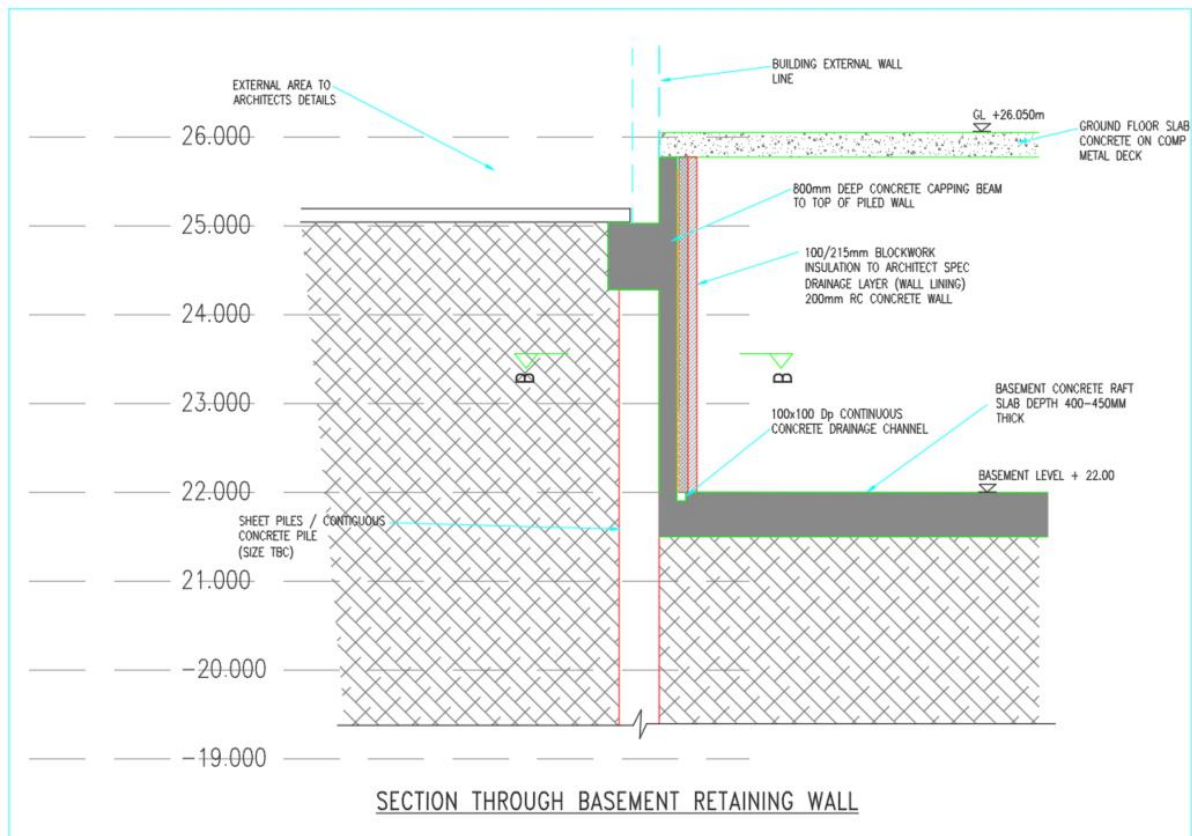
Typical Section through Basement Construction at retained pile excavation
